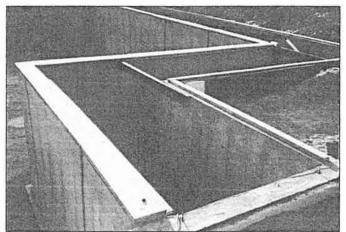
The north side of the basement is thermally buffered by a 6-foot wide by 8-foot deep by 100-foot long double envelope. This view shows the space before it was capped with Flexcore pre-stressed concrete slabs (see Figure 3). The finished buffer, accessible through doors from the basement, serves as a wine cellar and general storage area.
